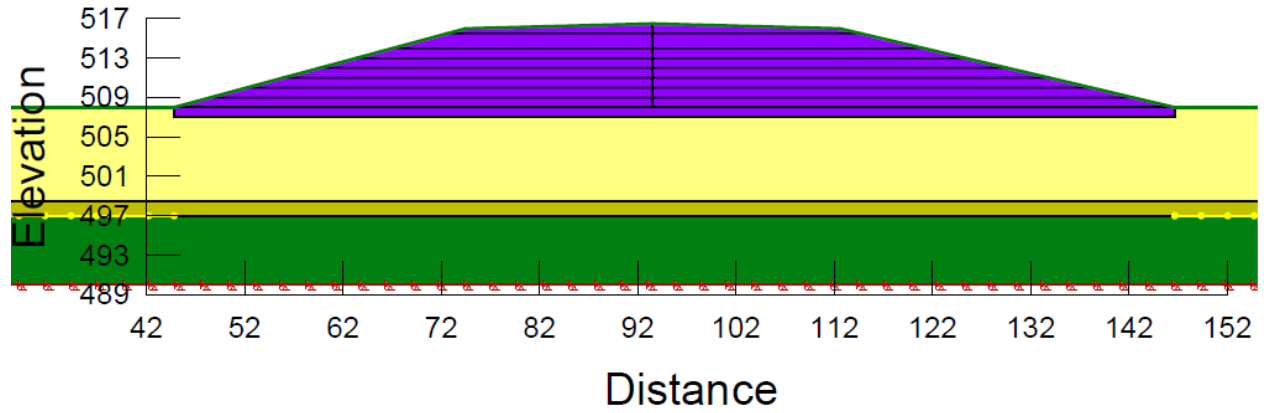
FEM South Abutment Cross-Section Model TH17-01 Piezometer Water Pressure Model
